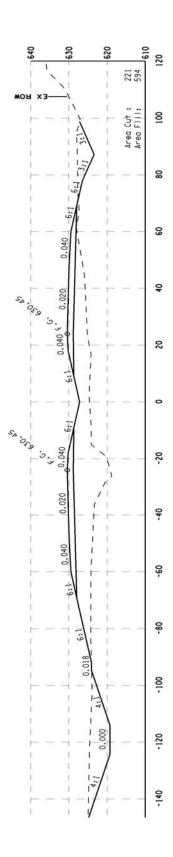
A-20. Portion of Cross Section Sheet (With Template Ditch and Special Ditch)
